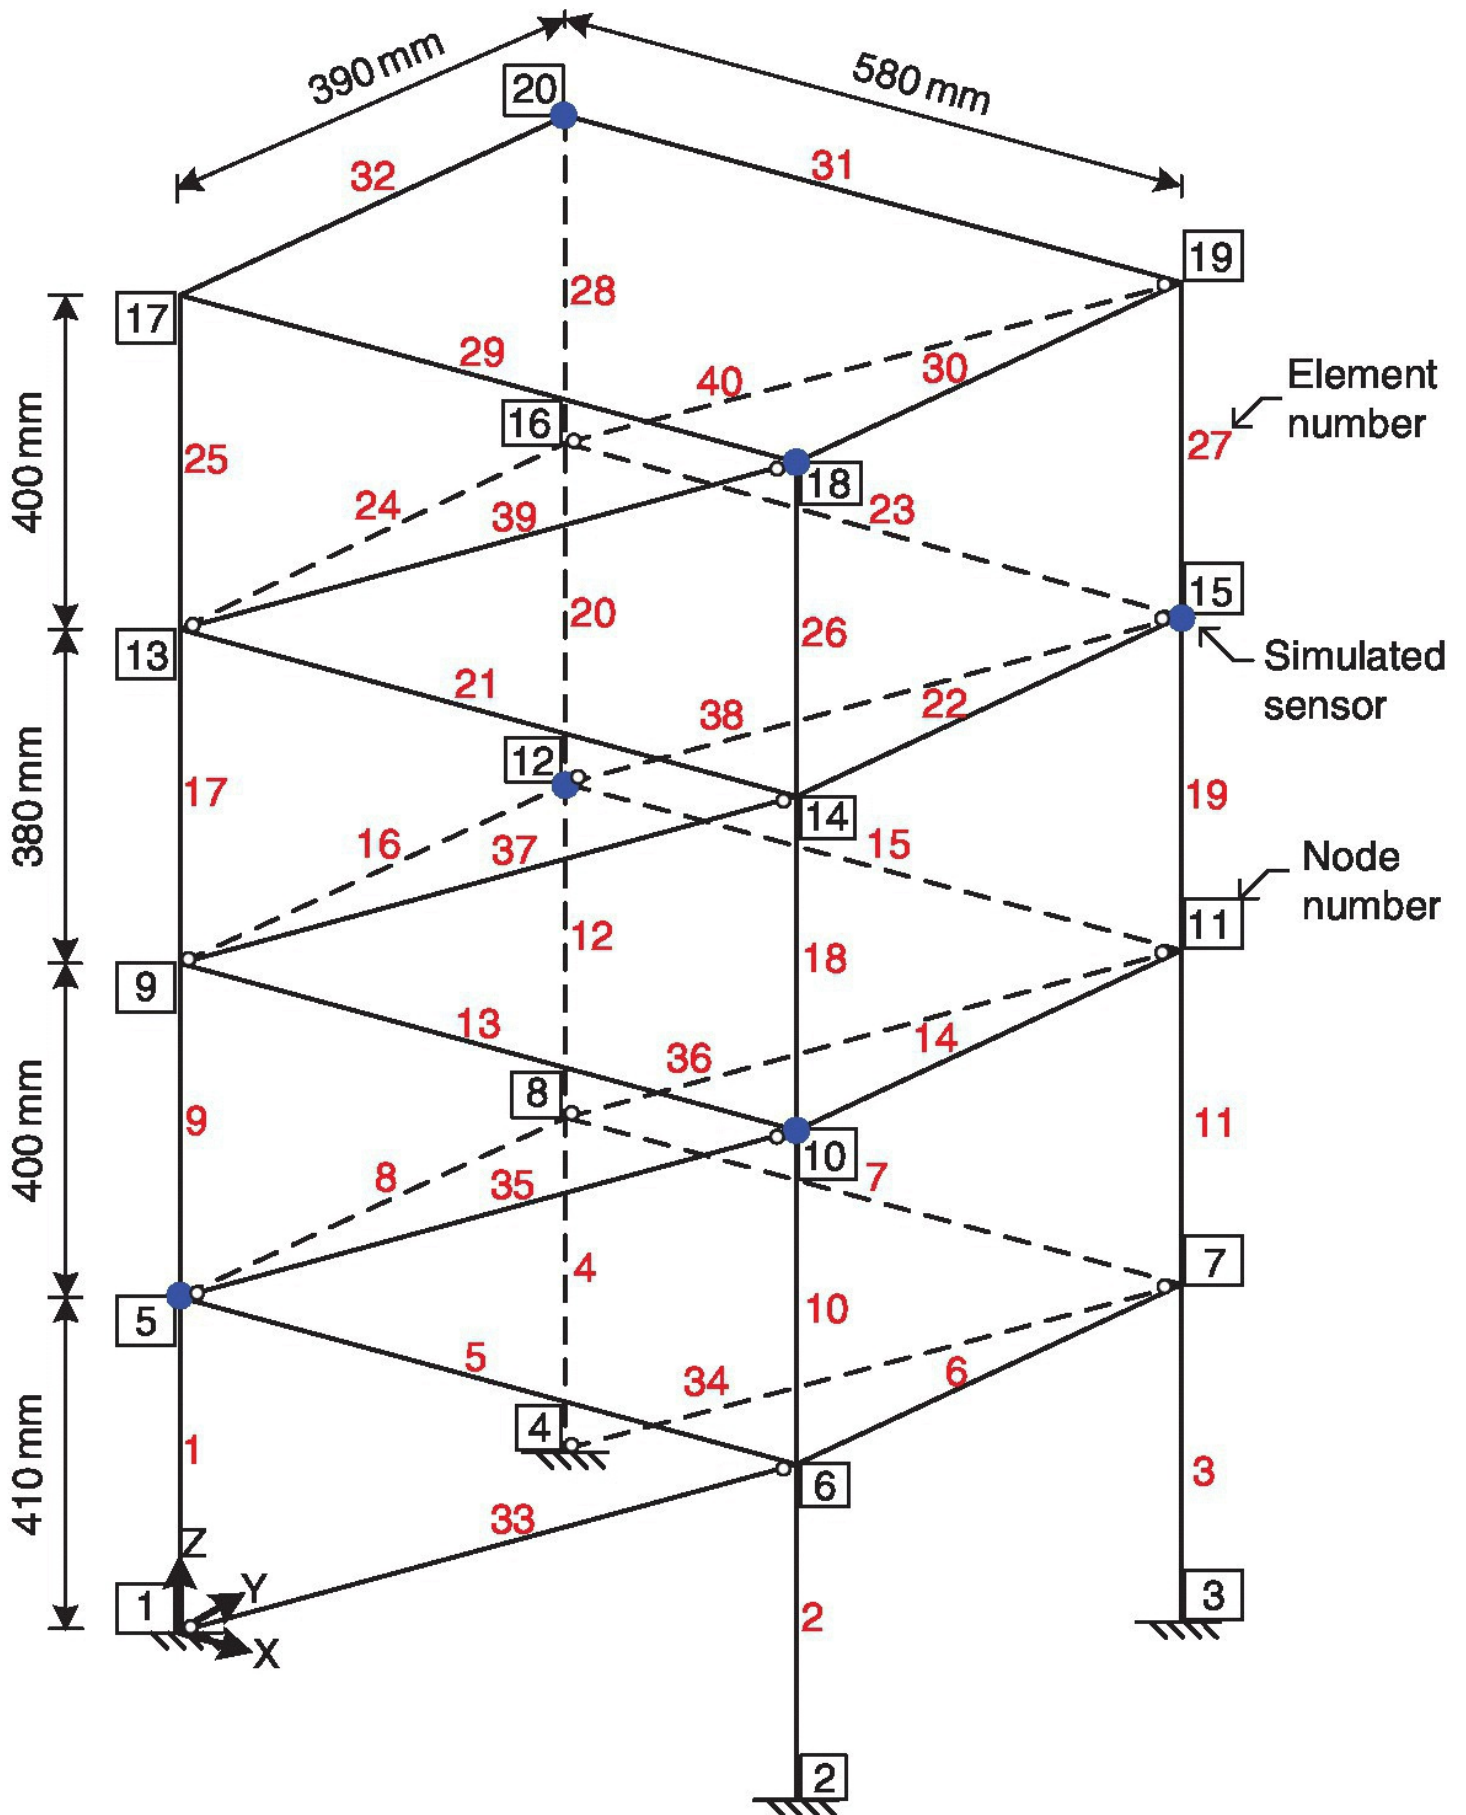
Finite element model of the laboratory tested space steel frame structure.
